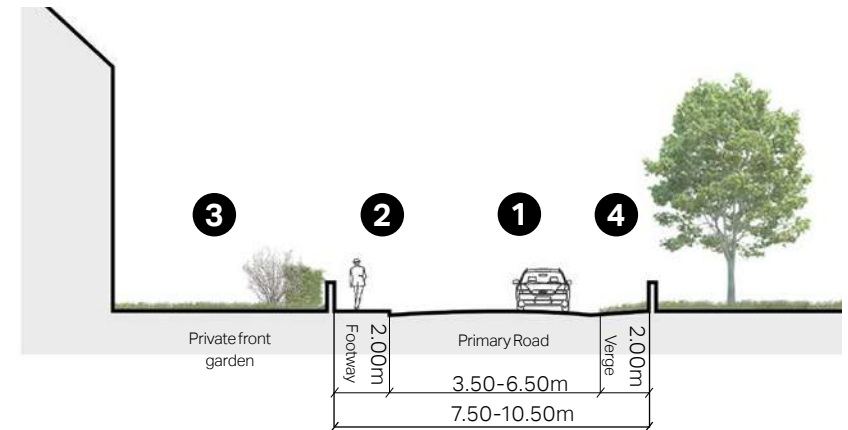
Section showing indicative dimensions for primary routes at rural edge (road width may vary to provide space for parking)
